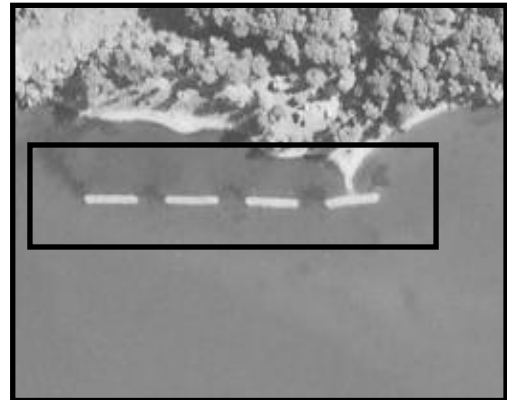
Aerial photo of the breakwater at Mason Neck, VA.
